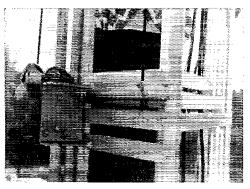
The winch is bolted to a bracket of 1/4-inch steel which, in turn, is welded to a pair of 3/8-inch thick cross-braces on the tower. The winch shown has outboard gears, and is not a recommended type. See text.
